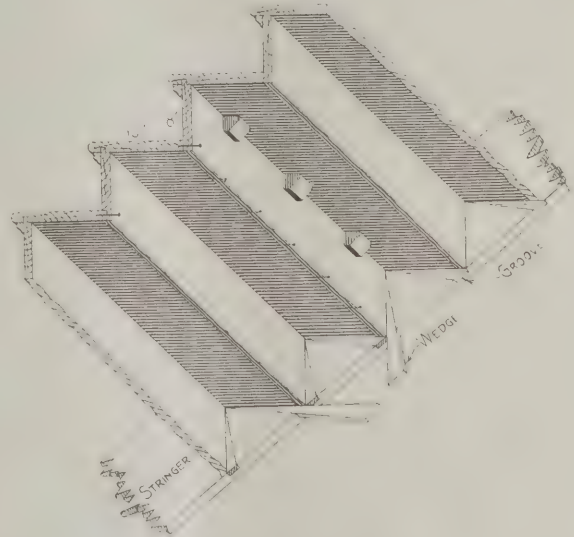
Perspective View Showing Under Side of the Steps and Wall Stringer
